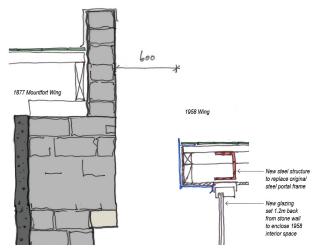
Proposed 1877 Wall / 1958 Roof Junction
